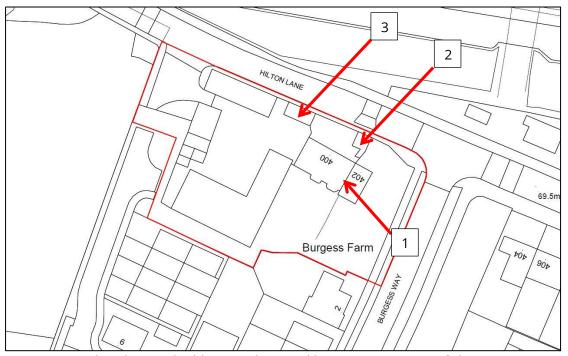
Site Plan showing building numbers and locations (Courtesy of client)
